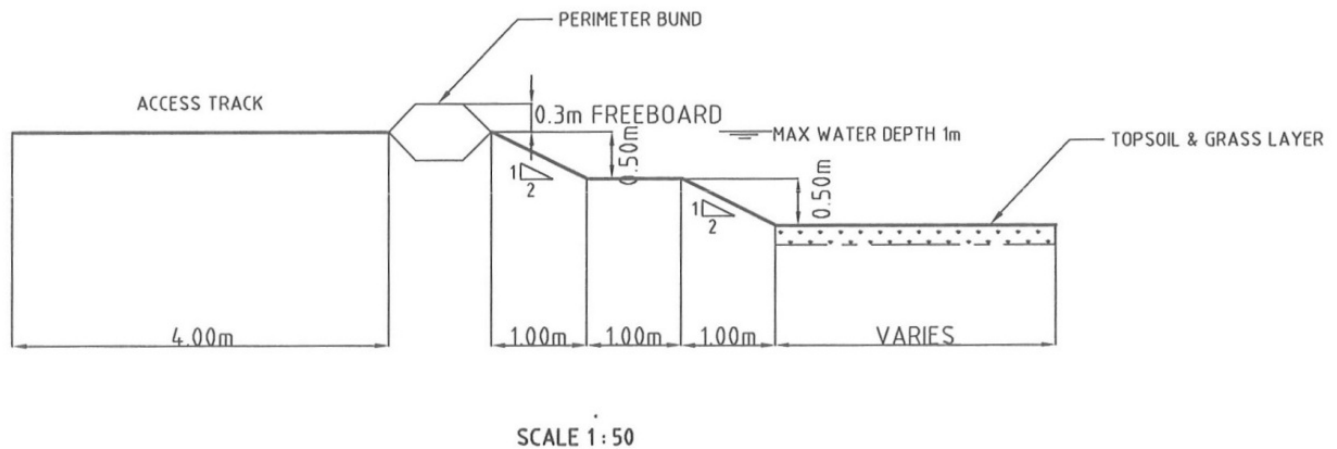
Infiltration Basin or Dry Pond Typical Bank Cross-Section
